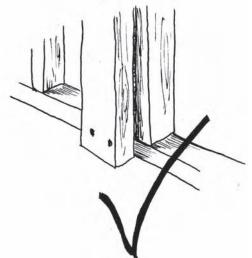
Installation of a door stud 45 mm longer than a standard stud to negate the need for a short section of bottom wall plate beneath the stud
